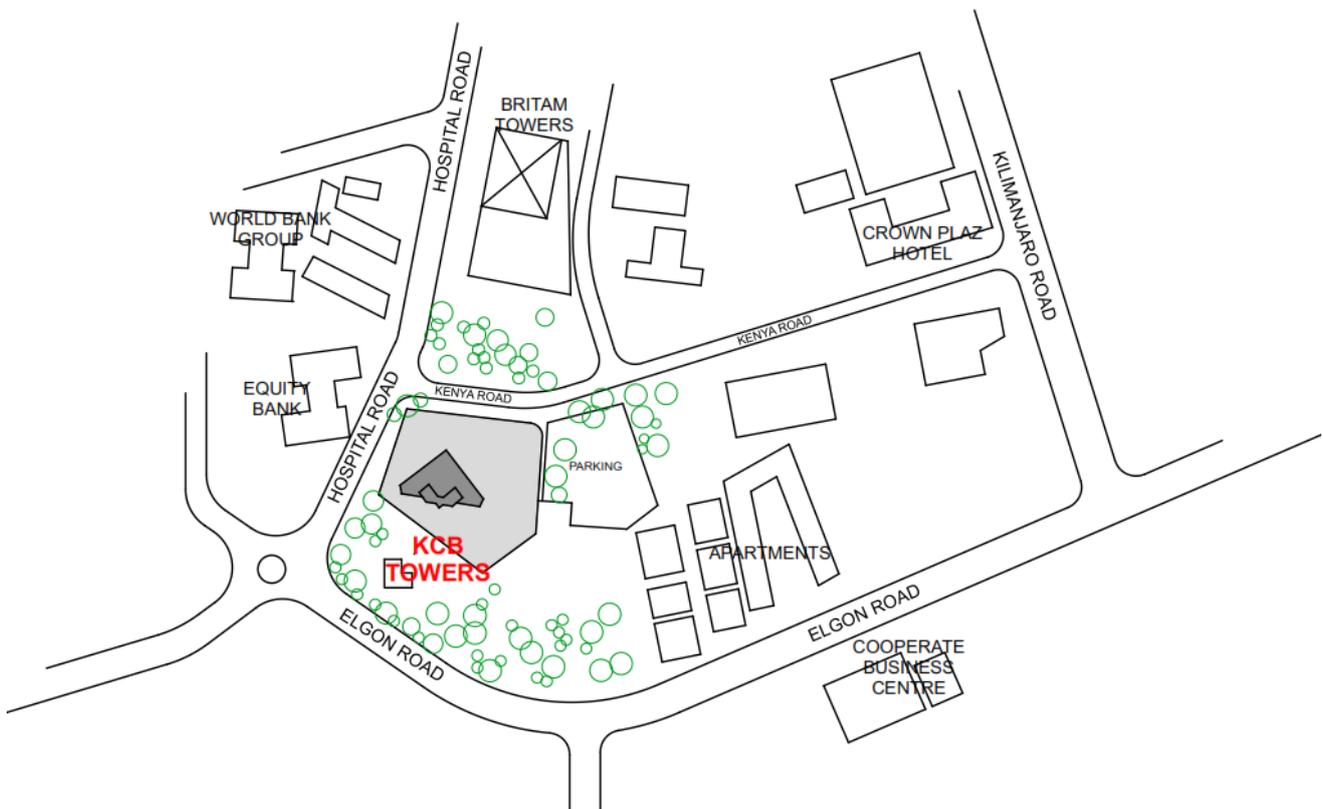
KCB Towers location plan. Source: Planning Systems 2008
